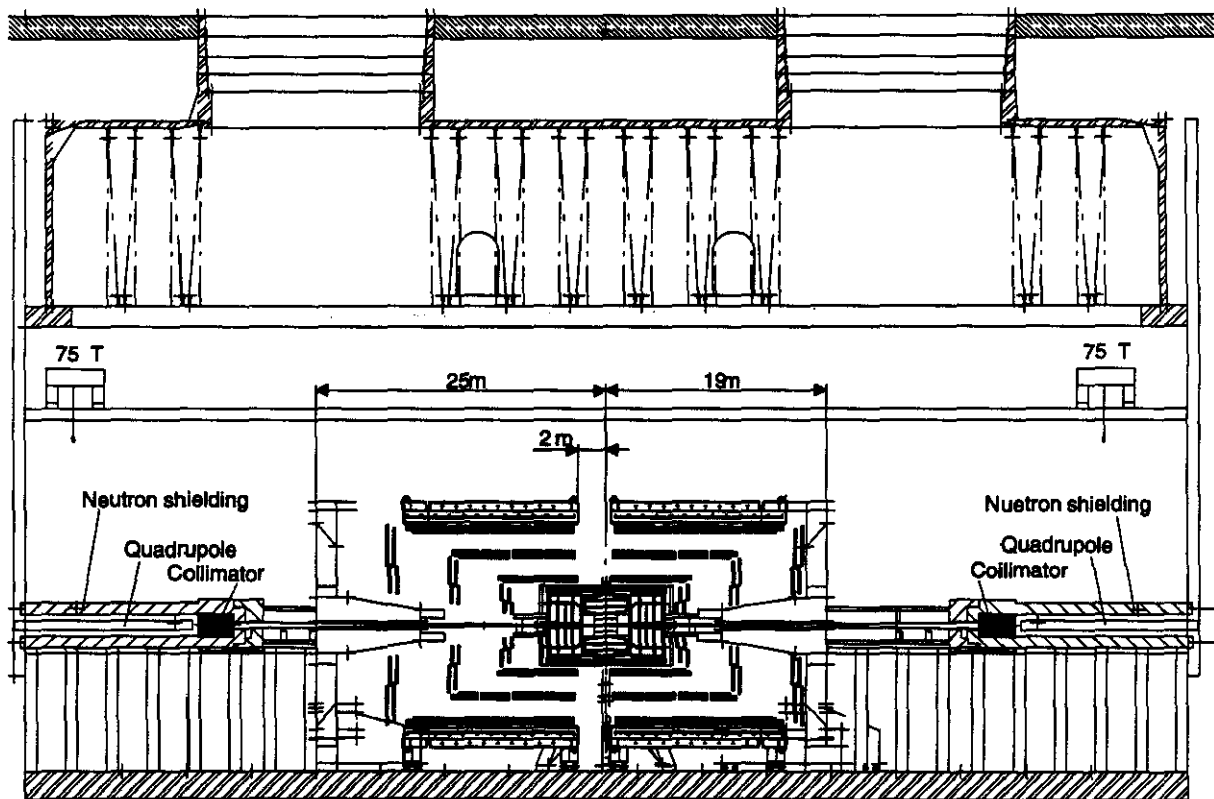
Dimensioned elevation view: 2-m inner access opening.
